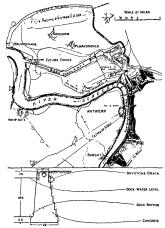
GENERAL PLAN OF THE PORT OF ANTWERP BELG AND INSET OF A TYPICAL CROSS SECTION OF THE QUAY WALLS IN THE BASSIN CANAL
